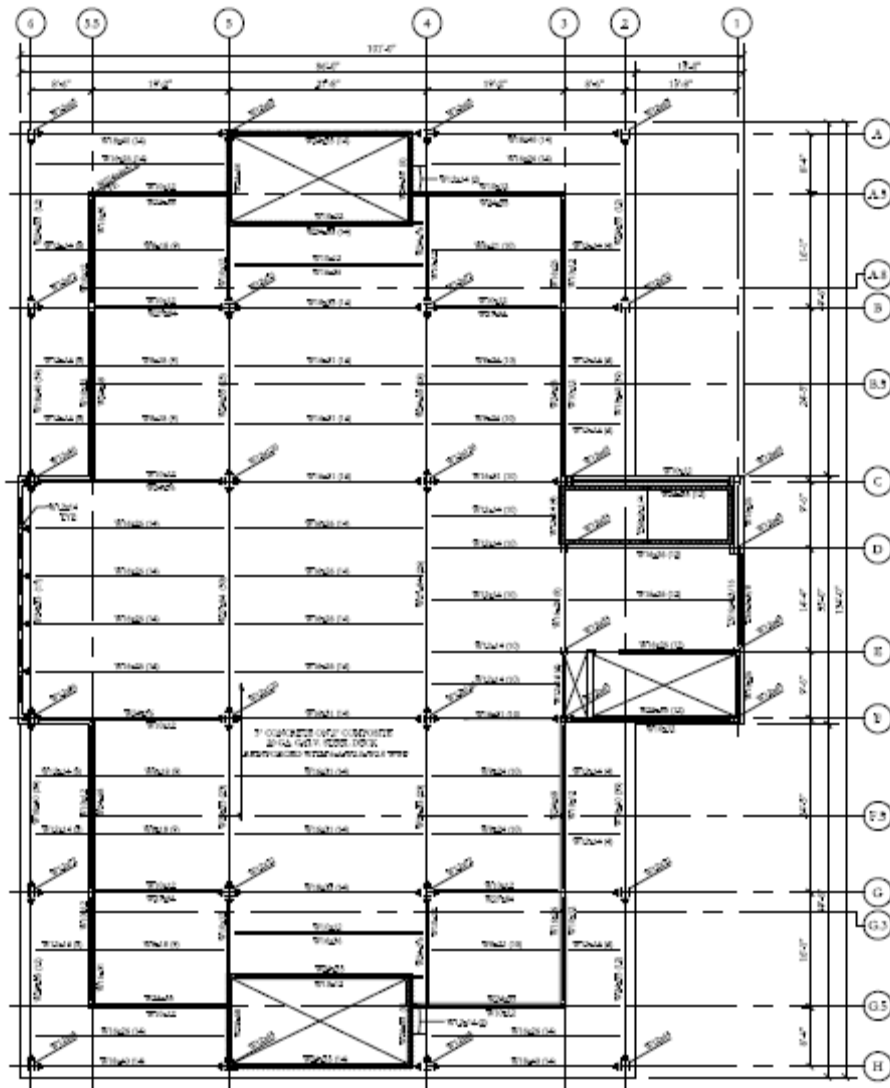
Existing Steel Structural System 5th Floor Framing Plan
